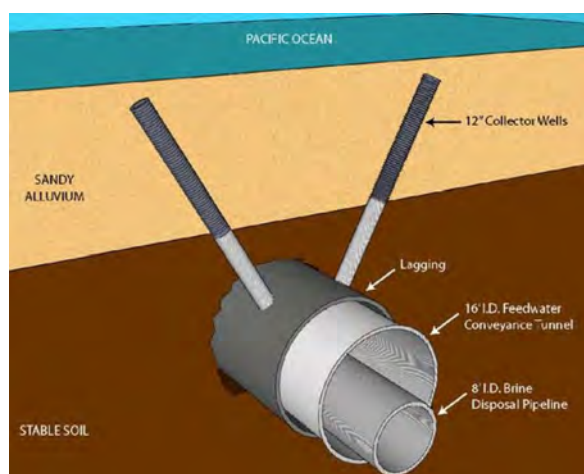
Tunnel intake example. Photo: RBF Consulting, 2009.
